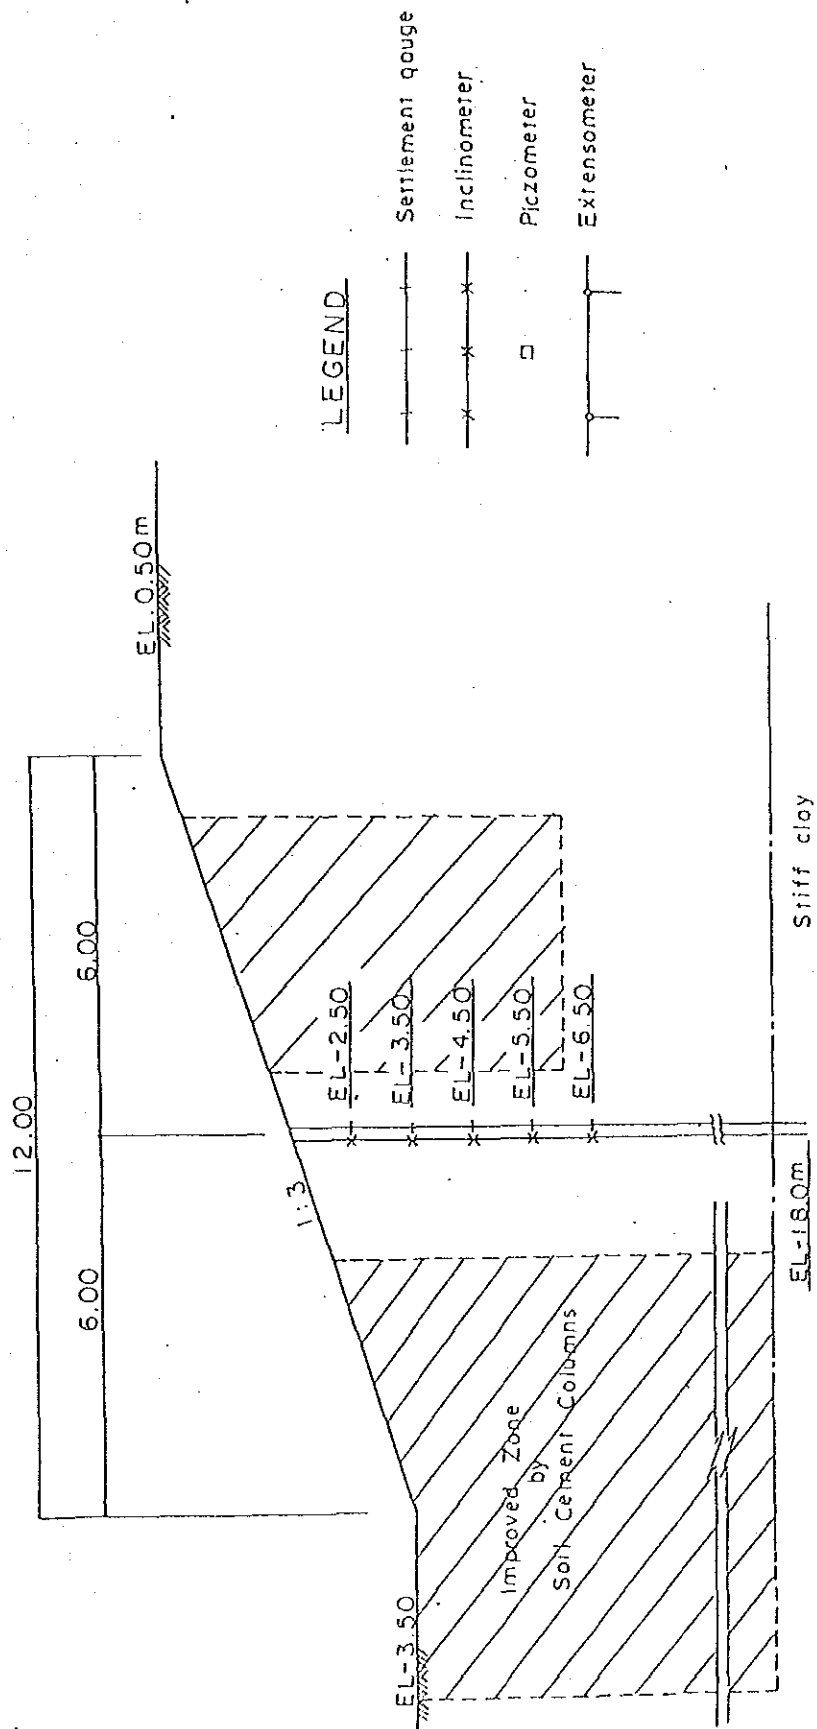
Installation Plan of Monitoring Instrument on Improved Slope by Soil Cement Columns
